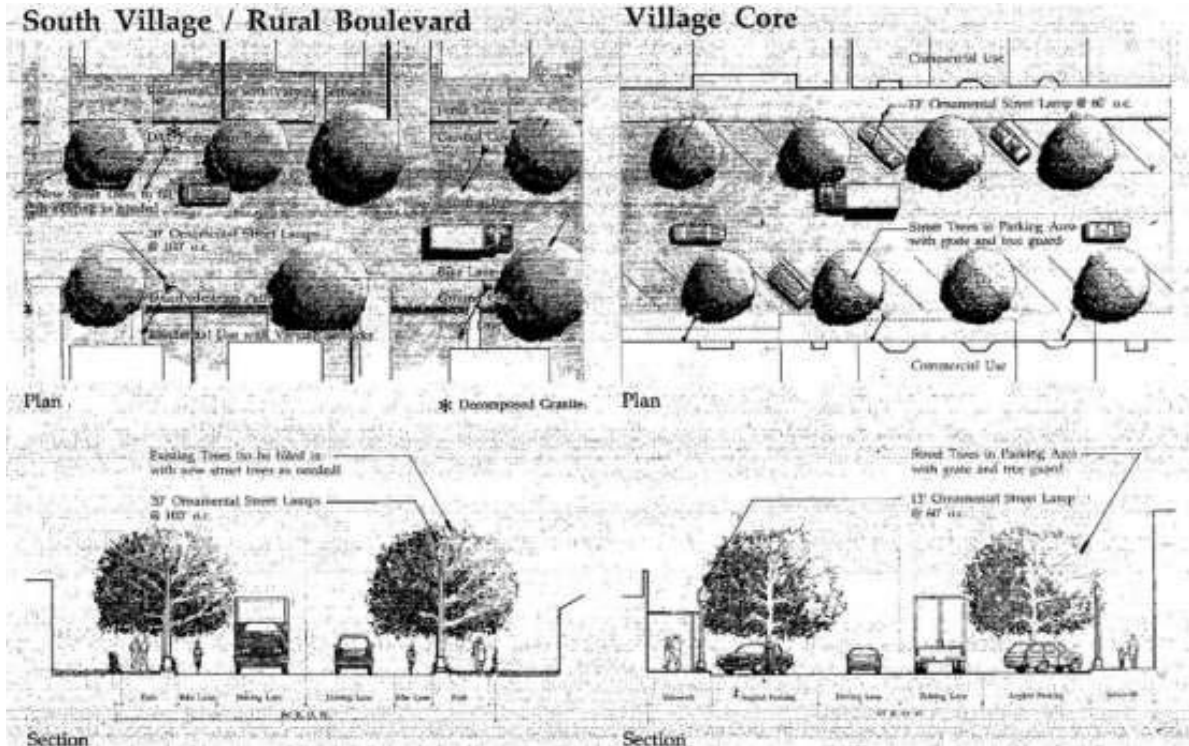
Boulder Creek Schematic Highway and Design Plan, Boulder Creek Town Plan
